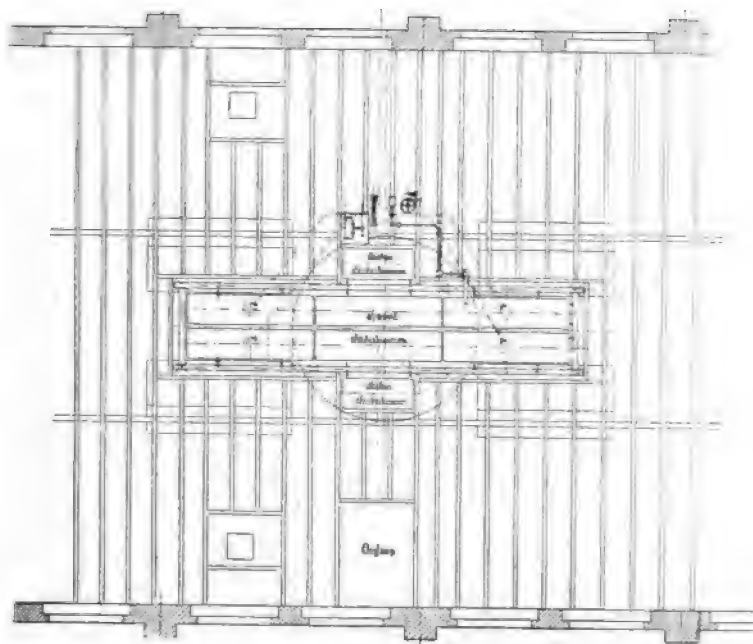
TOMPSON BANKING ARRANGEMENT—PLAN.
